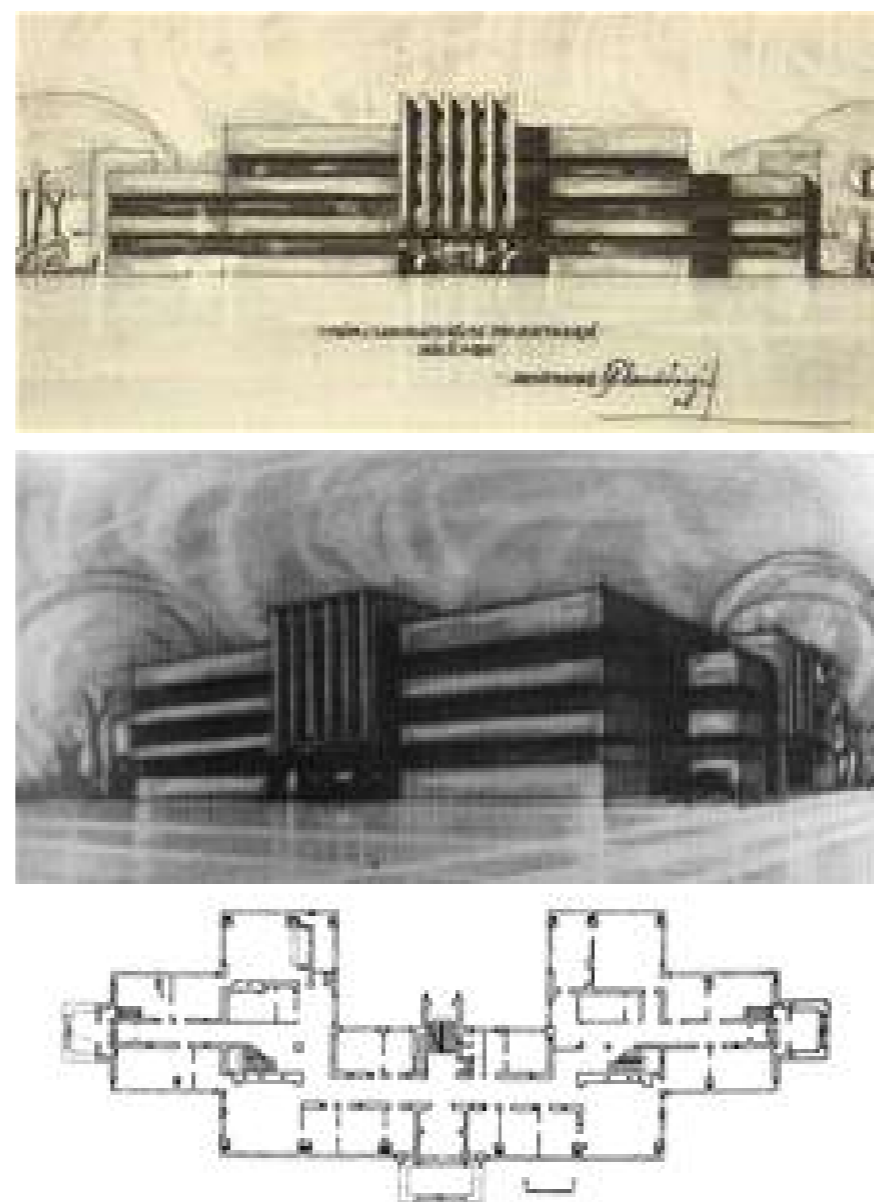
Architect V. Landsbergis-Žemkalnis made sketches of the building facades and a plan of the first floor.
